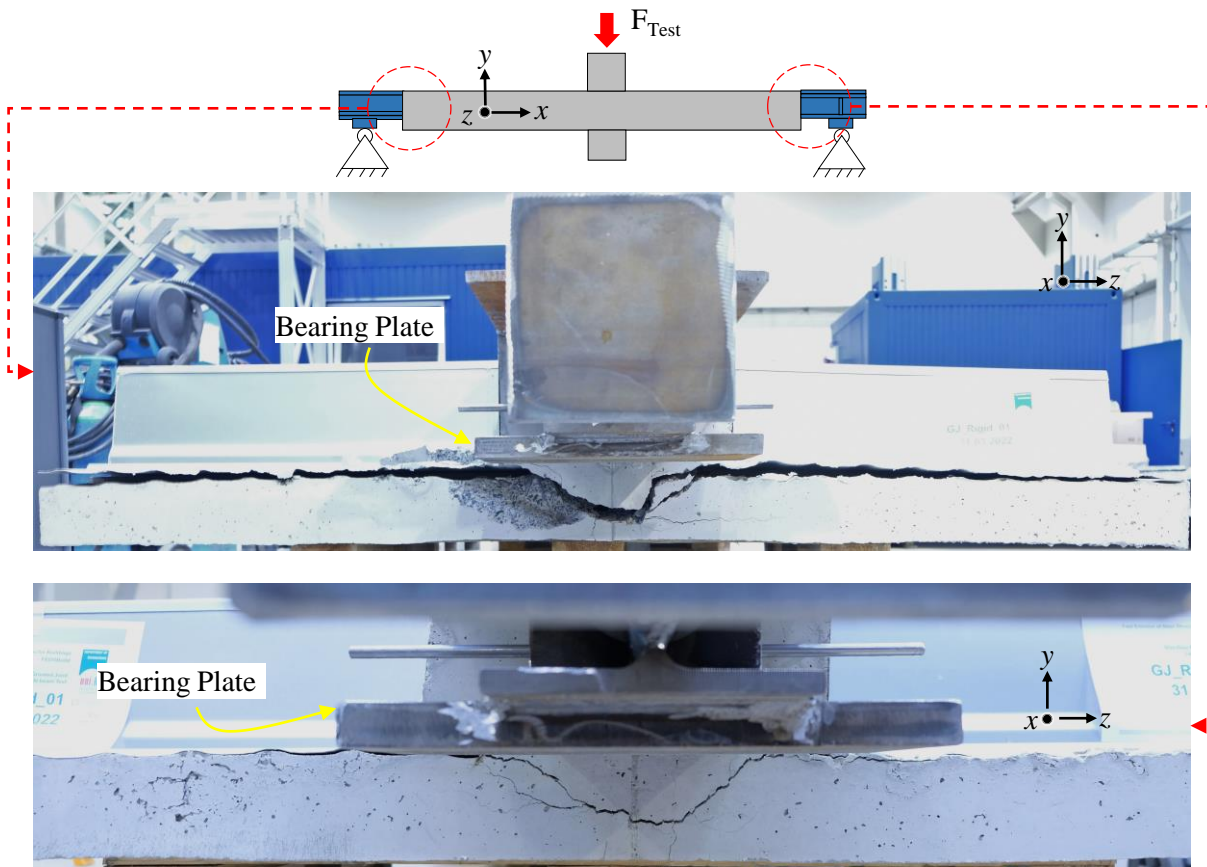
Longitudinal shear failure next to the roller supports / GJSFB-02 test specimen.
